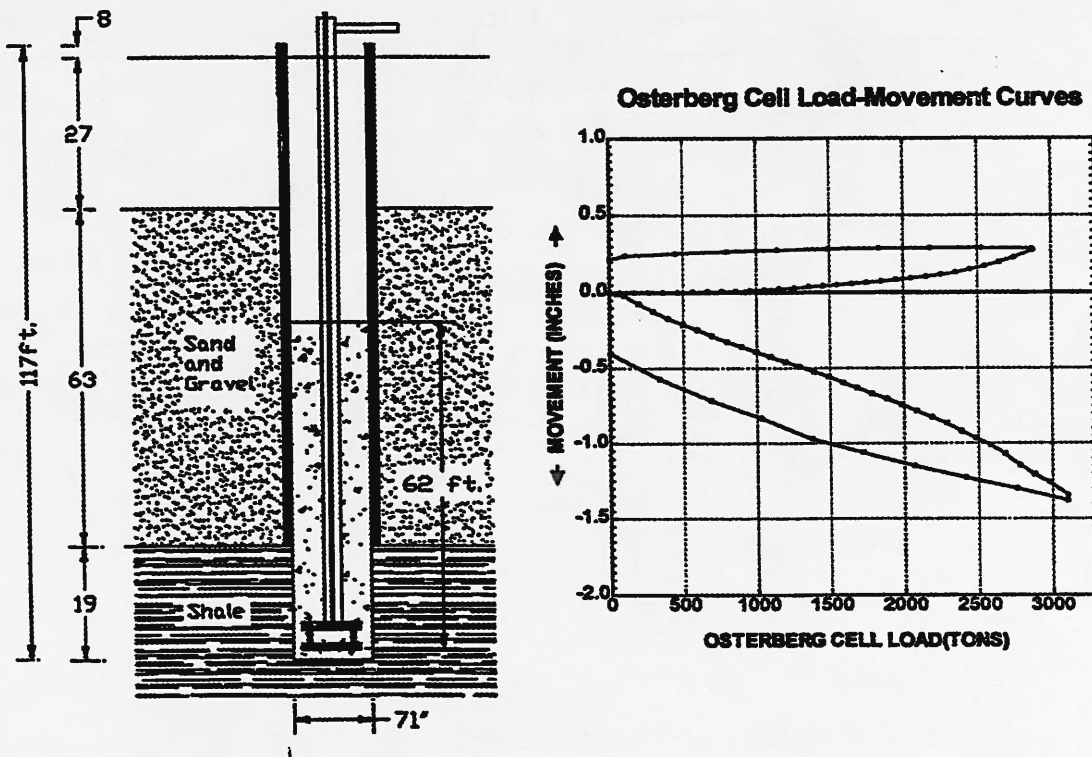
Test Shaft for Bridge in Owensboro, KY
